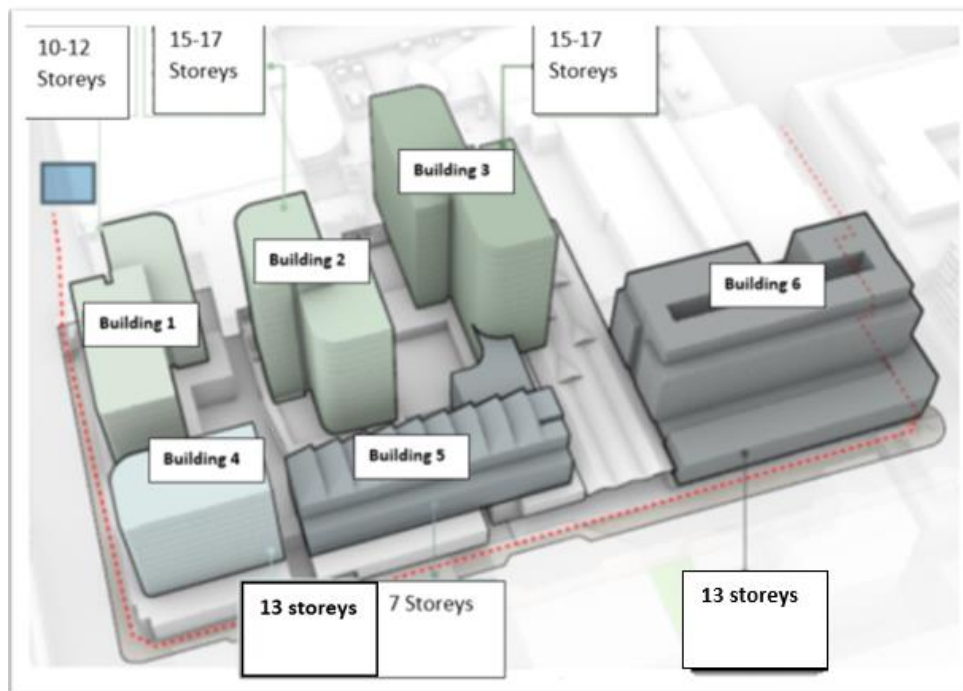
Proposed Building Heights within Doonside Precinct. Source: Planning Officer Report, Council Meeting 14 March 2023.
